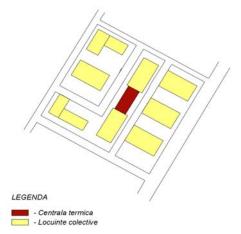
Example of central heating plant location in the quadrant of collective dwellings
